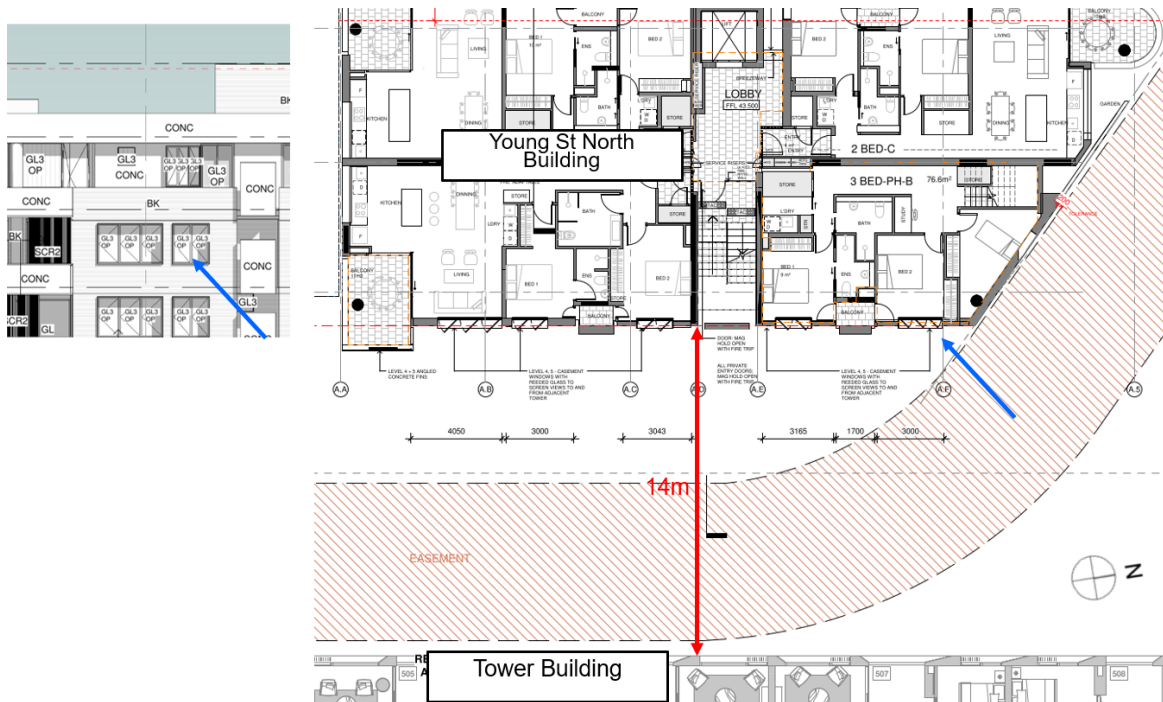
Visual privacy is mitigated between apartments located within the Young Street North and the Tower Building. Apartments in the Young Street building are proposed to be constructed with east-facing casement windows using fritted glass (blue arrows), where opposing windows are located 14m from the Tower Building.
